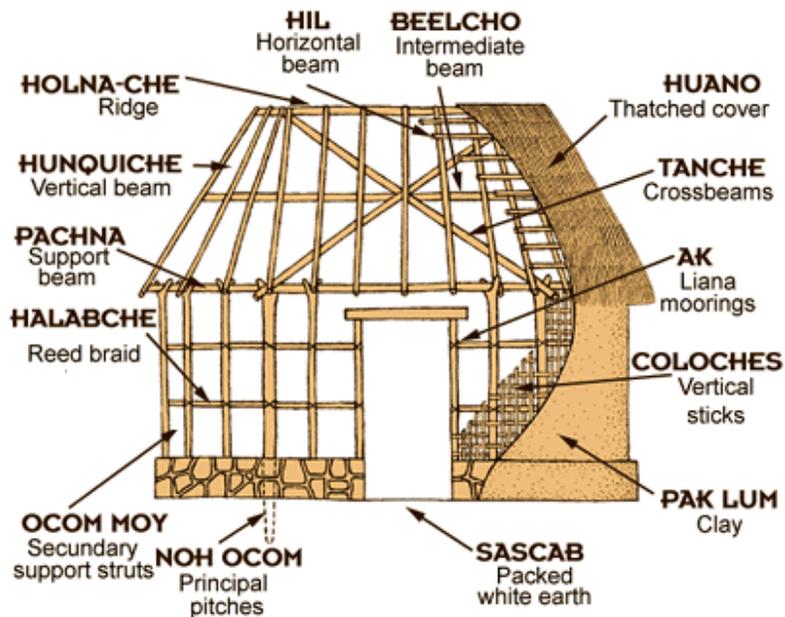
Typical Maya house and structure. (clio.missouristate.edu 2015)
